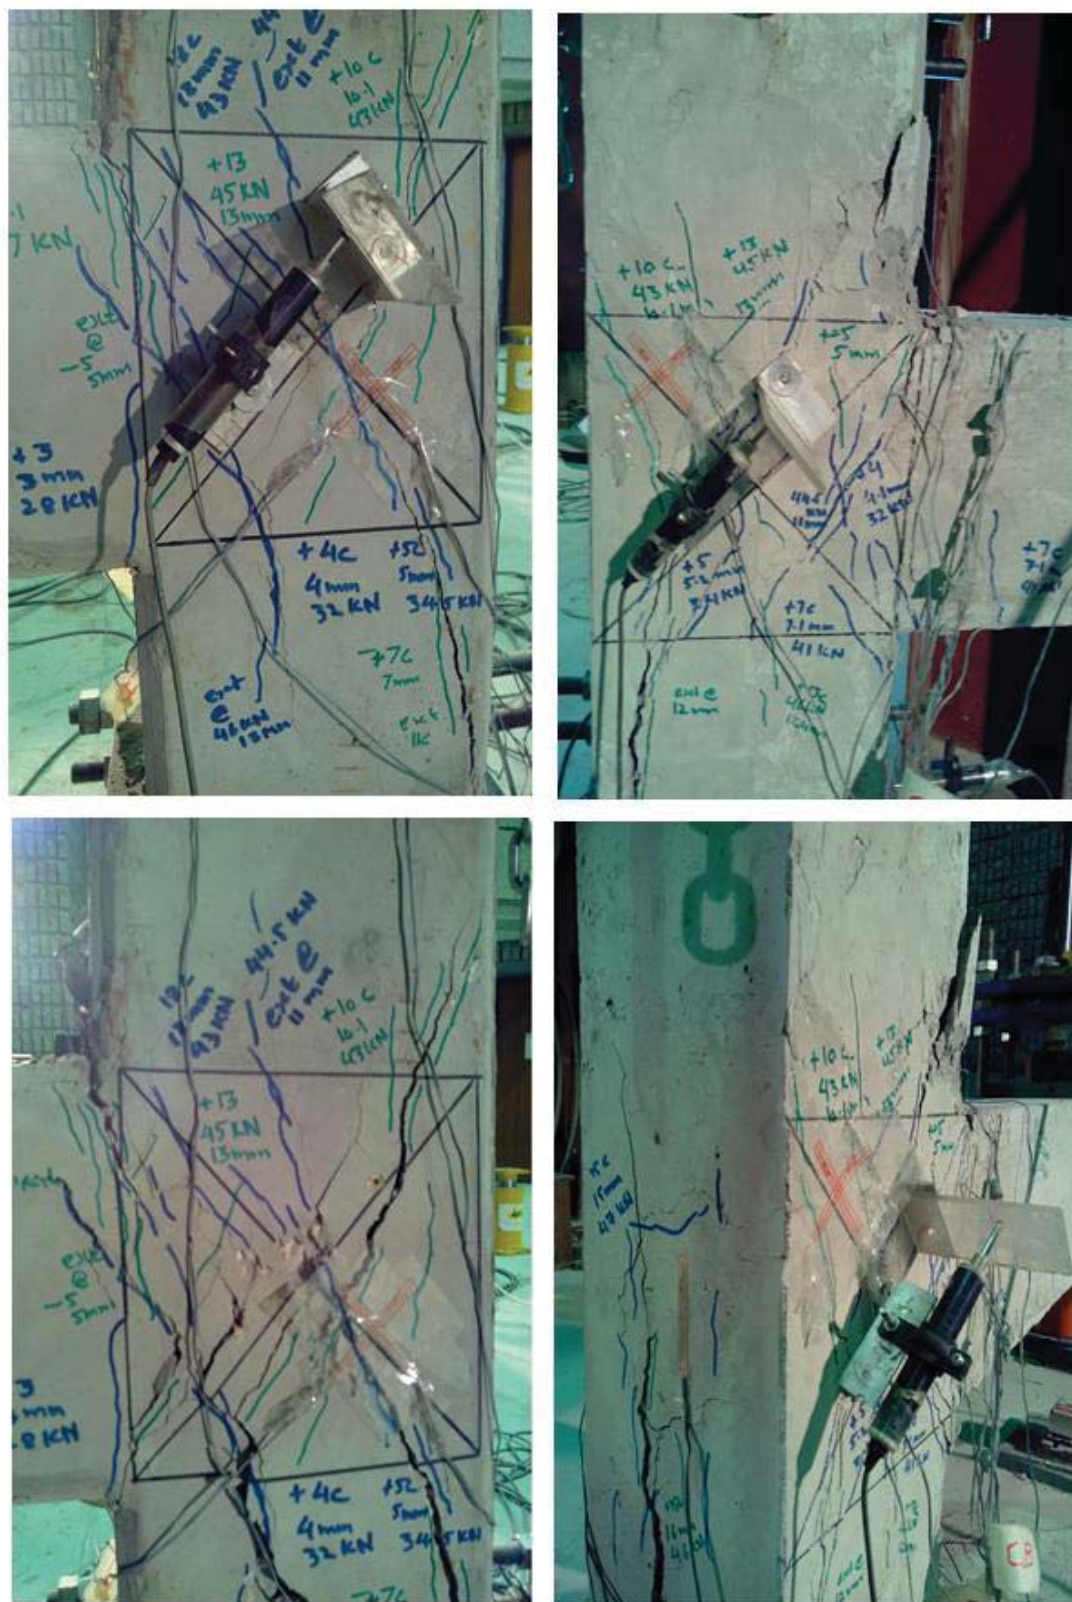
Crack pattern at intermediate and final loading stage of specimen SP-5
